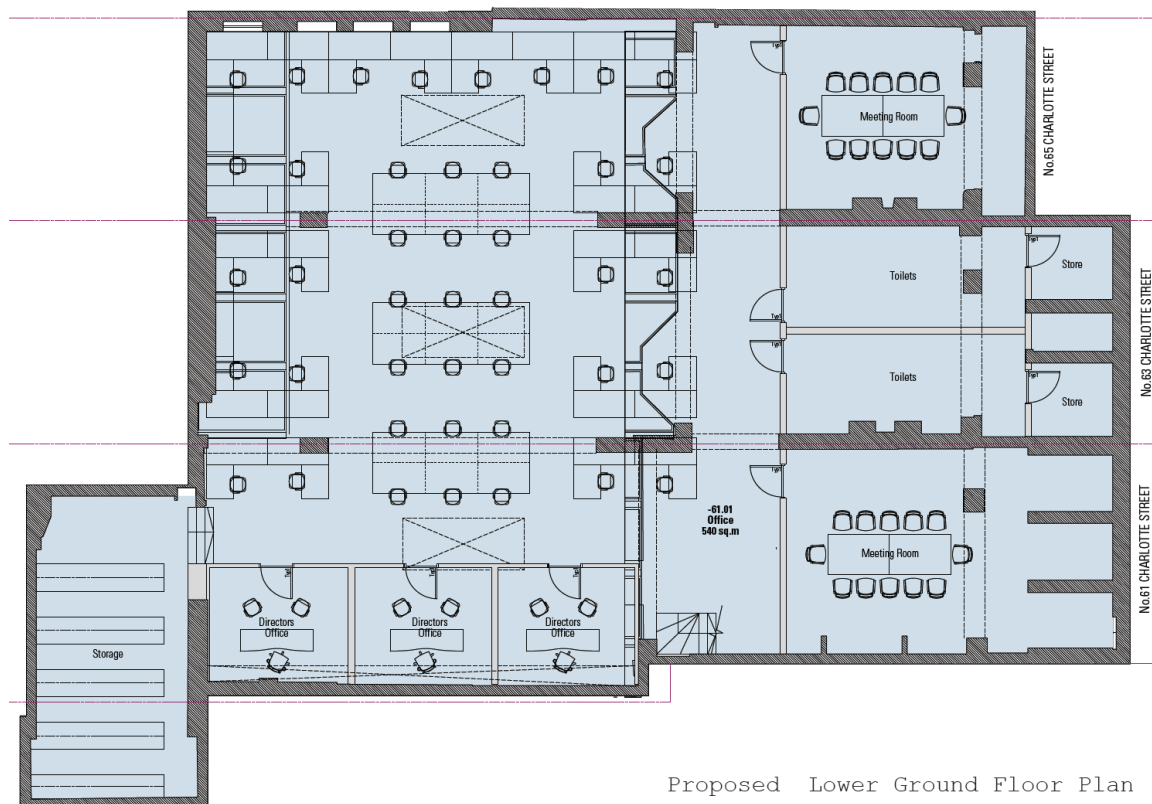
Proposed Ground Floor Layout – ensure correct drawings used - reissued
